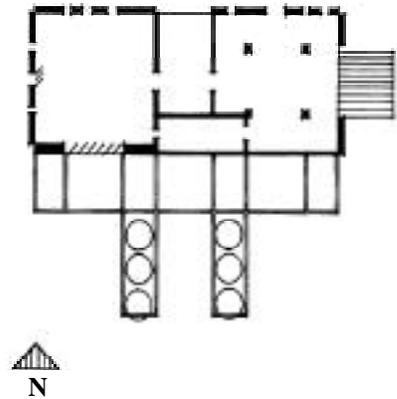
Ground floor plan of the Advanced Green Builder Demonstration Project.
